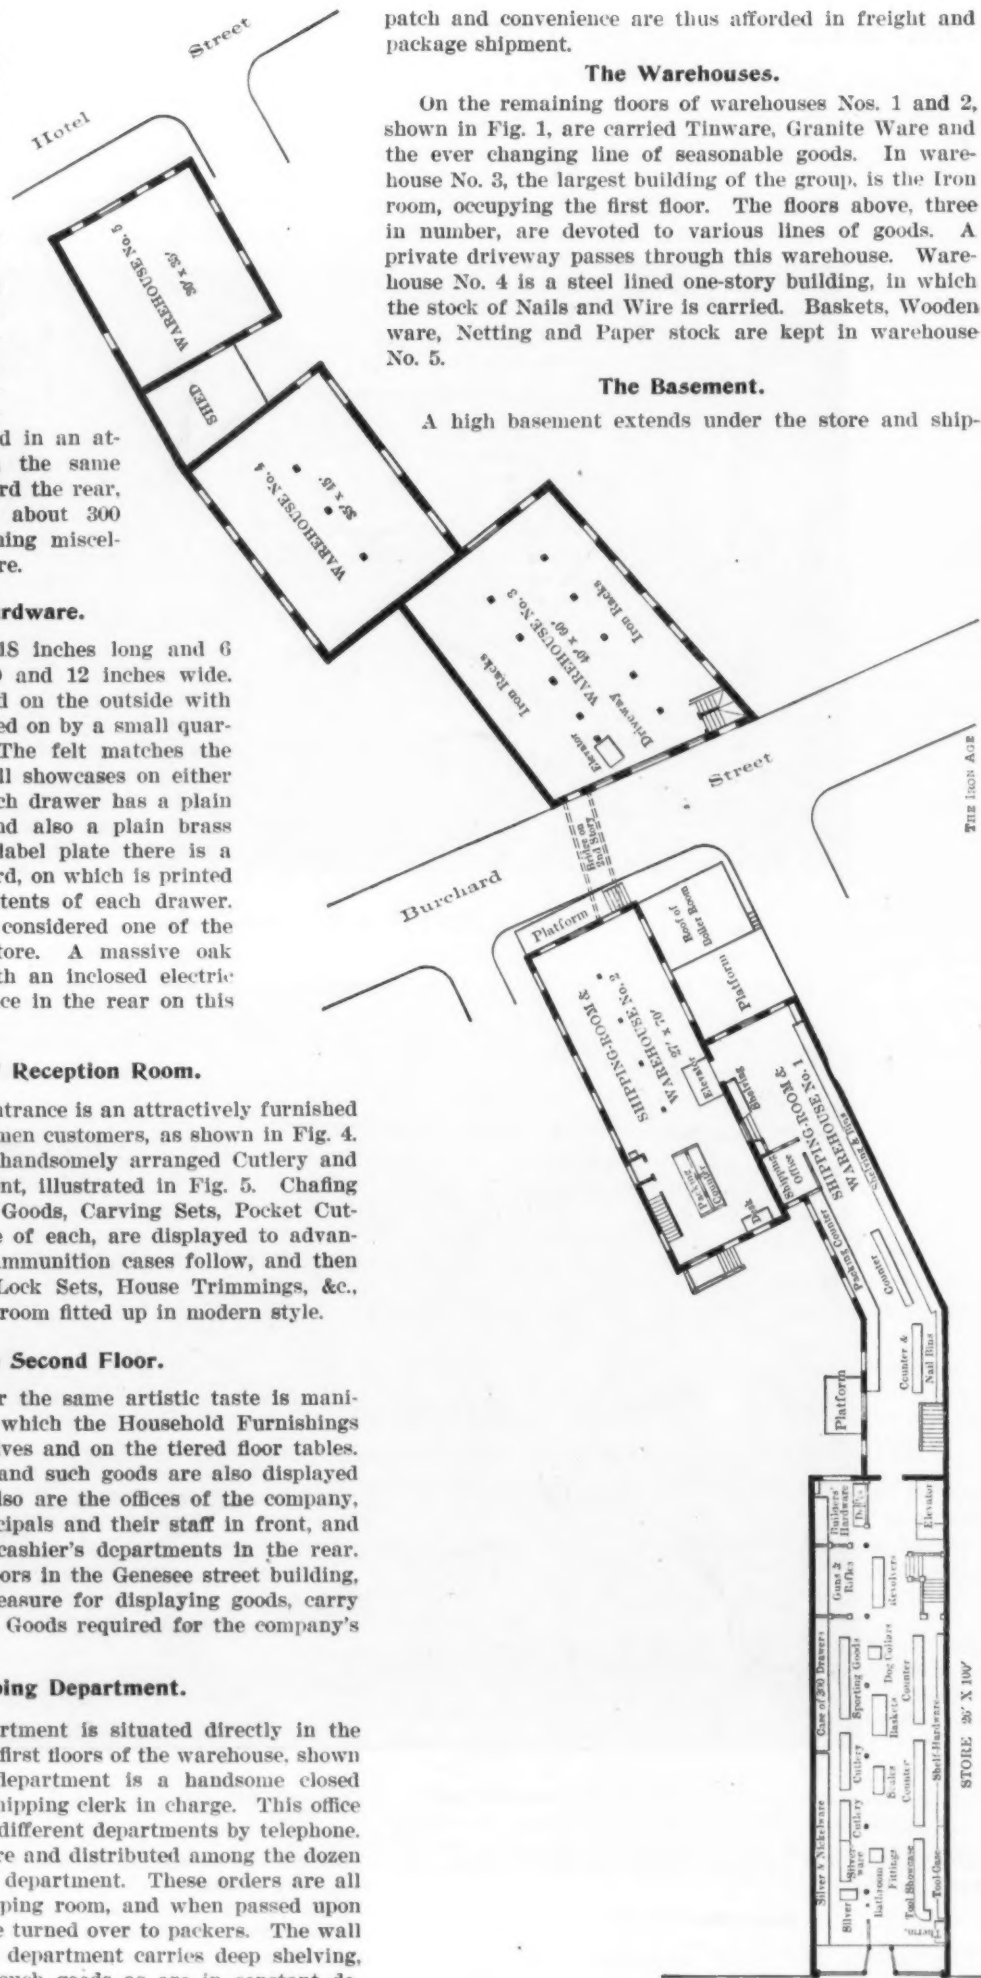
Floor Plan of the Roberts Hardware Company's Store.
